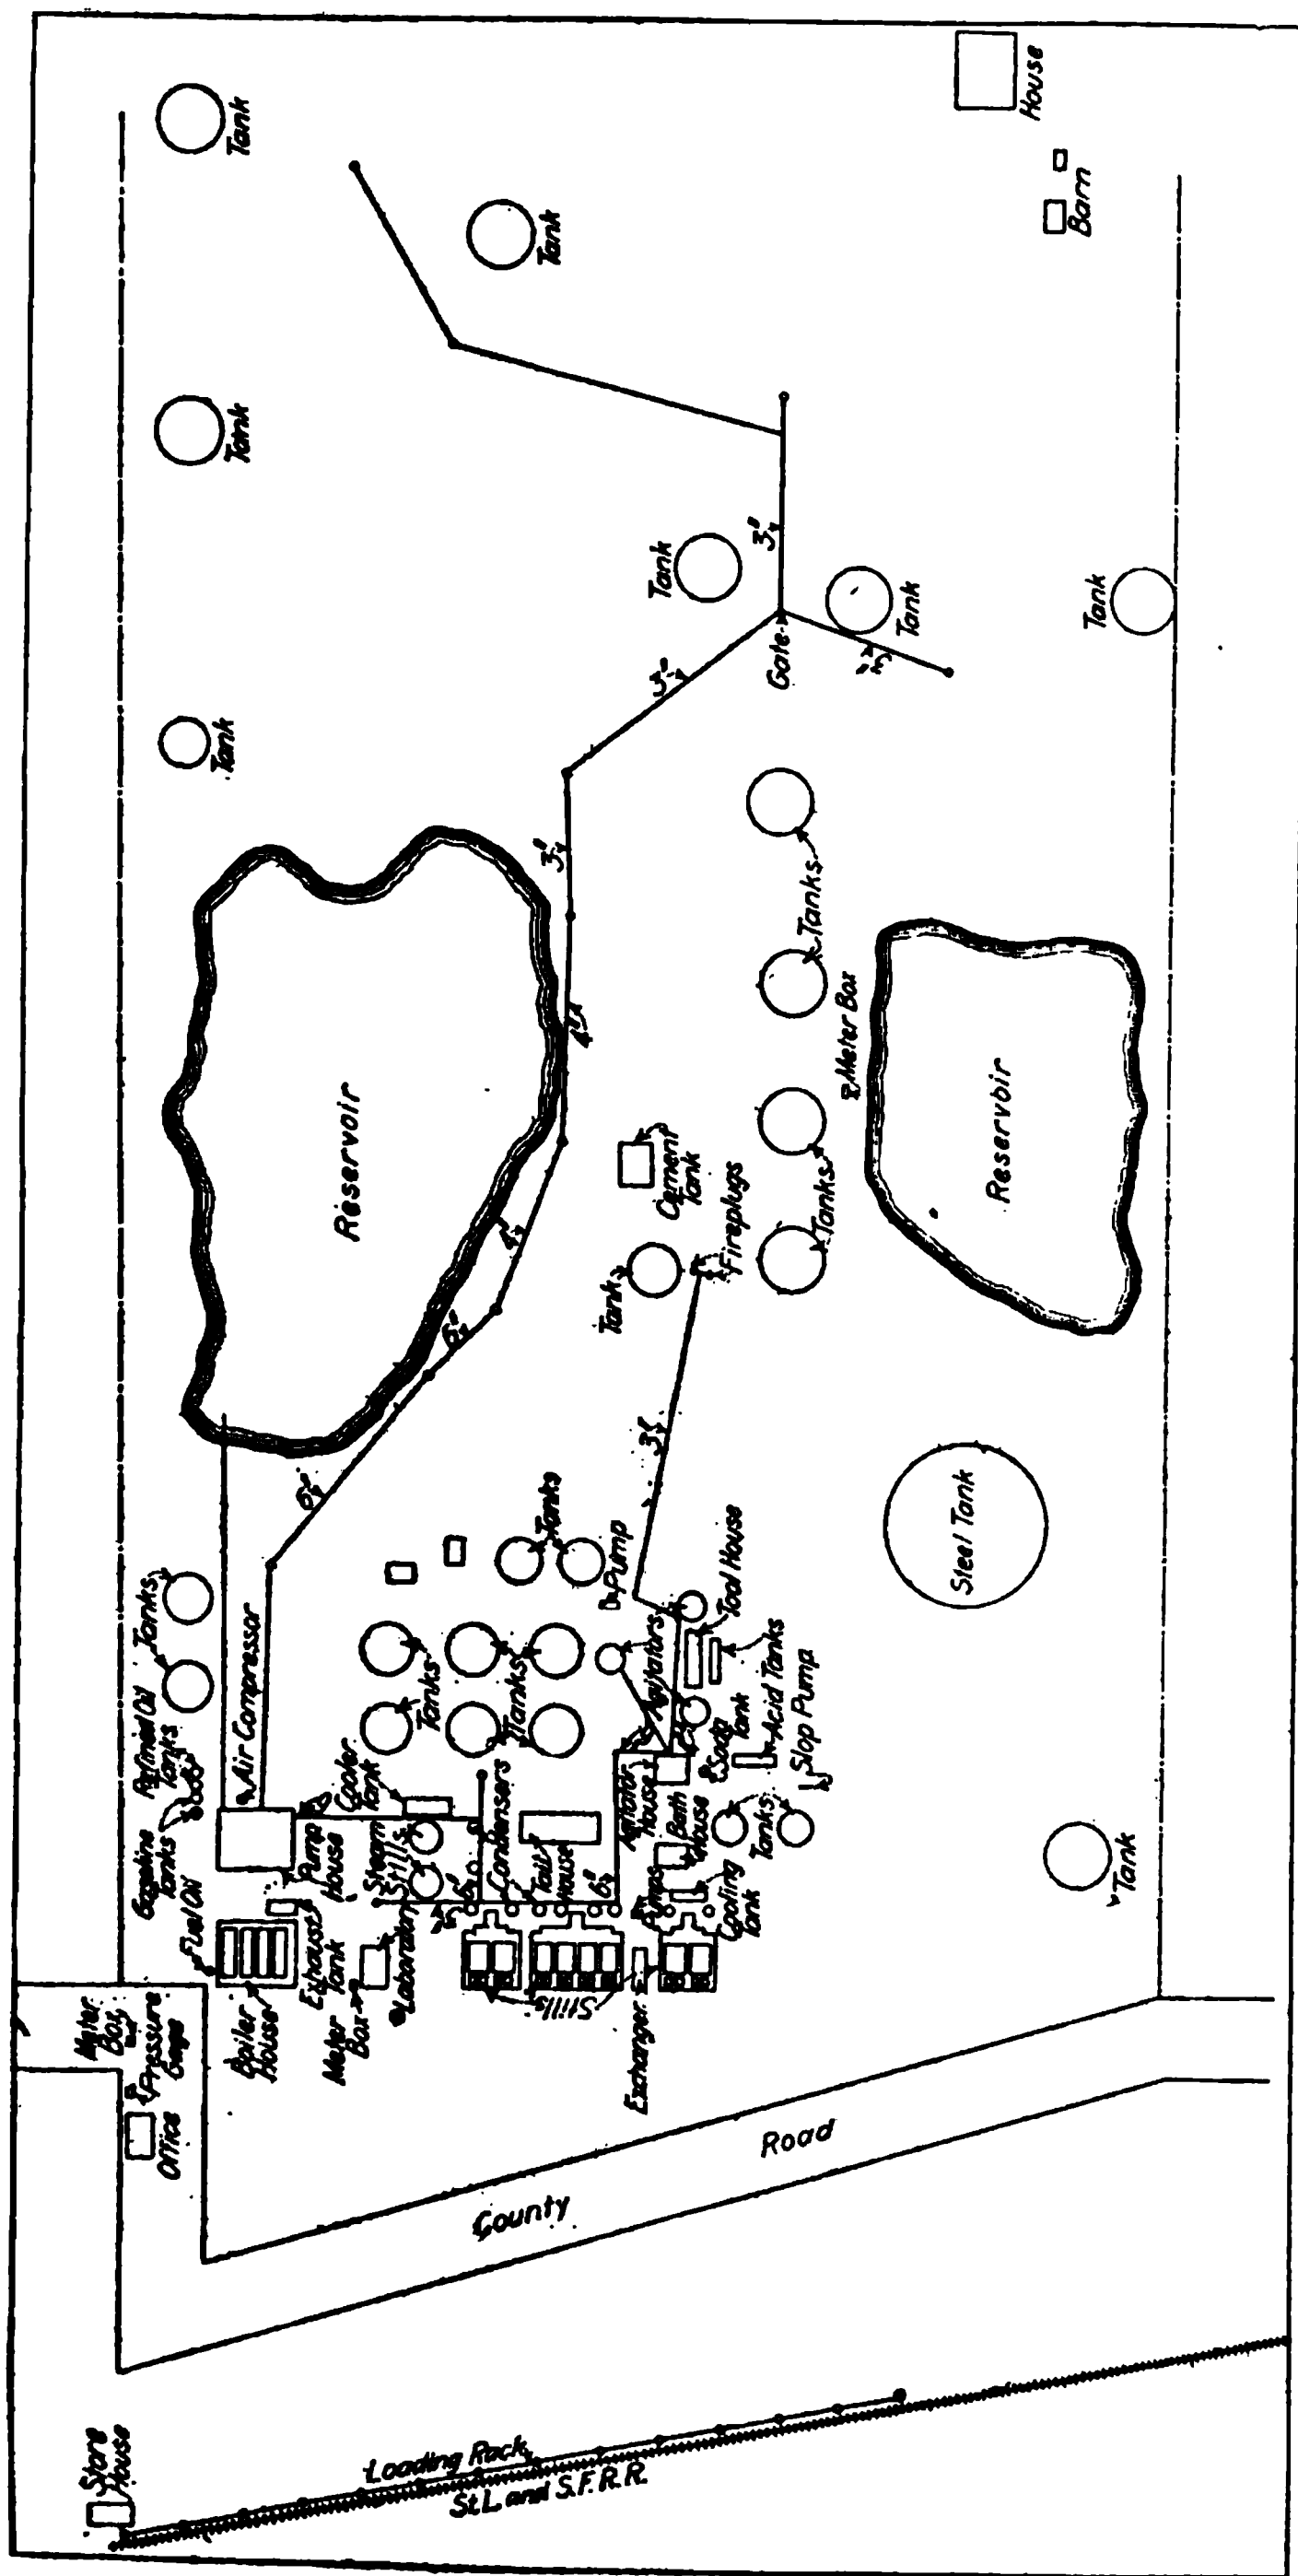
Layout of the plant of the Sapulpa Refining Company, Sapulpa, Okla. (Courtesy of W. D. Richardson, Sapulpa, Okla.)
